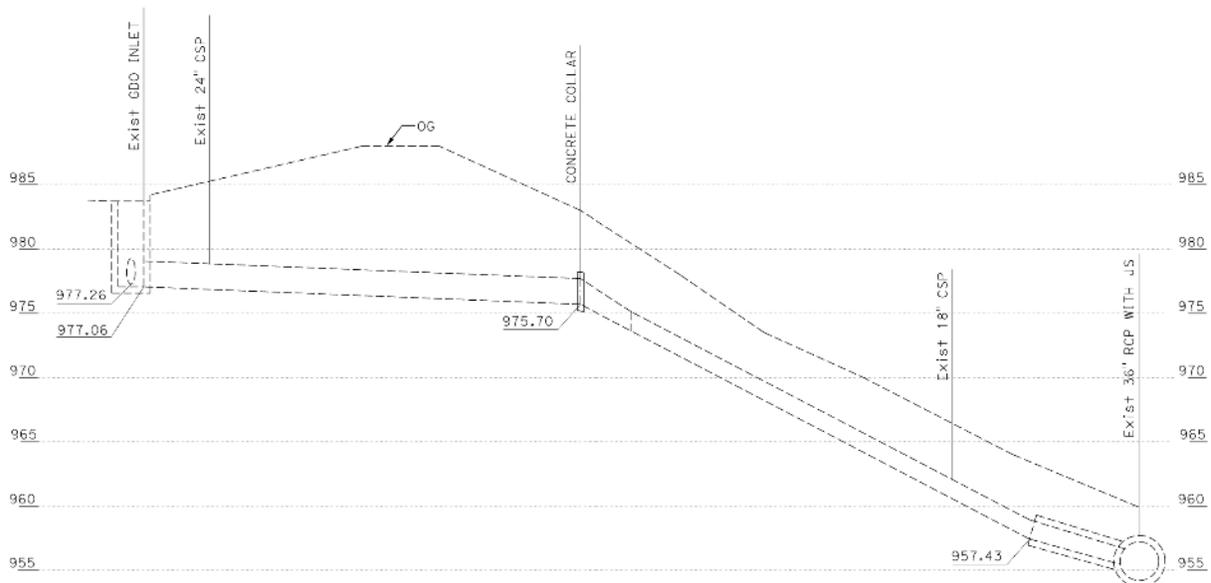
As-Built Drainage Profile Highway 118 Outfall at Chamberlain Street and Arleta Avenue
